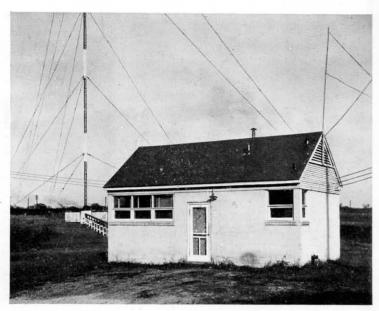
The WHHM transmitter building is constructed of concrete blocks. The windows were built near the ceiling, permitting a maximum amount of wall space and light.
